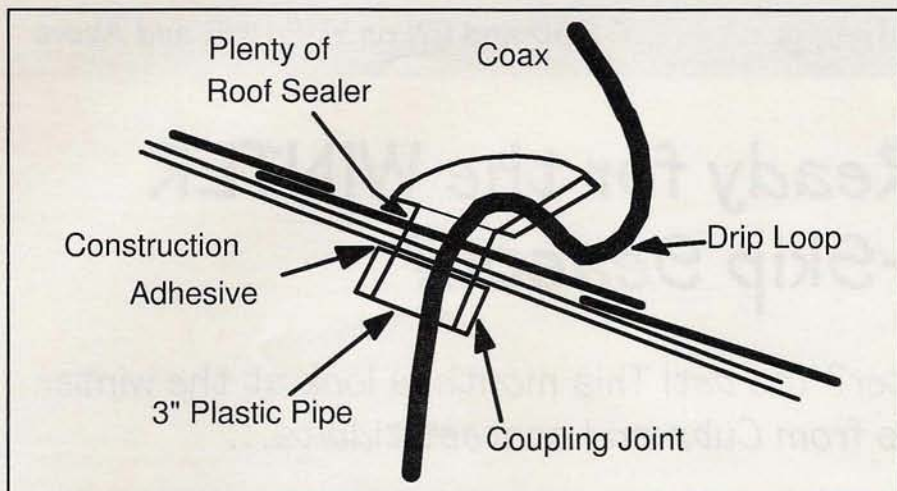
Detail of a rooftop cable feedthrough. Be sure to use plenty of construction adhesive on the inside, lots of roof sealer on the outside, and put a "dripleop" in the cables so water will drip out the roof instead of coming inside.
